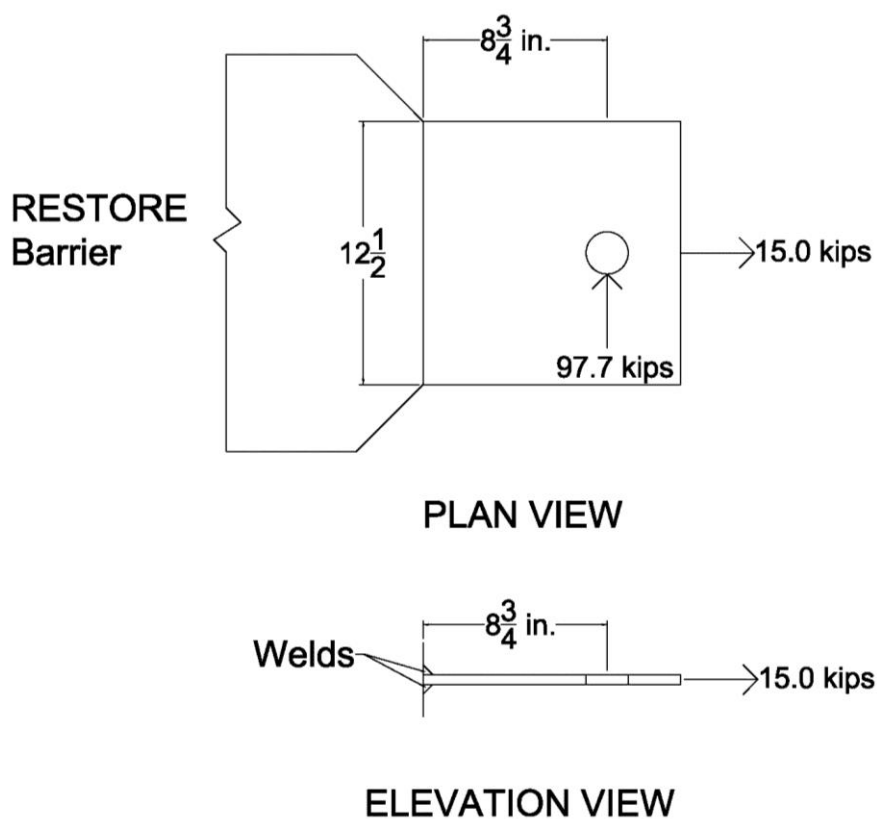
Loading and Dimension of Gusset Plate Fillet Welds
